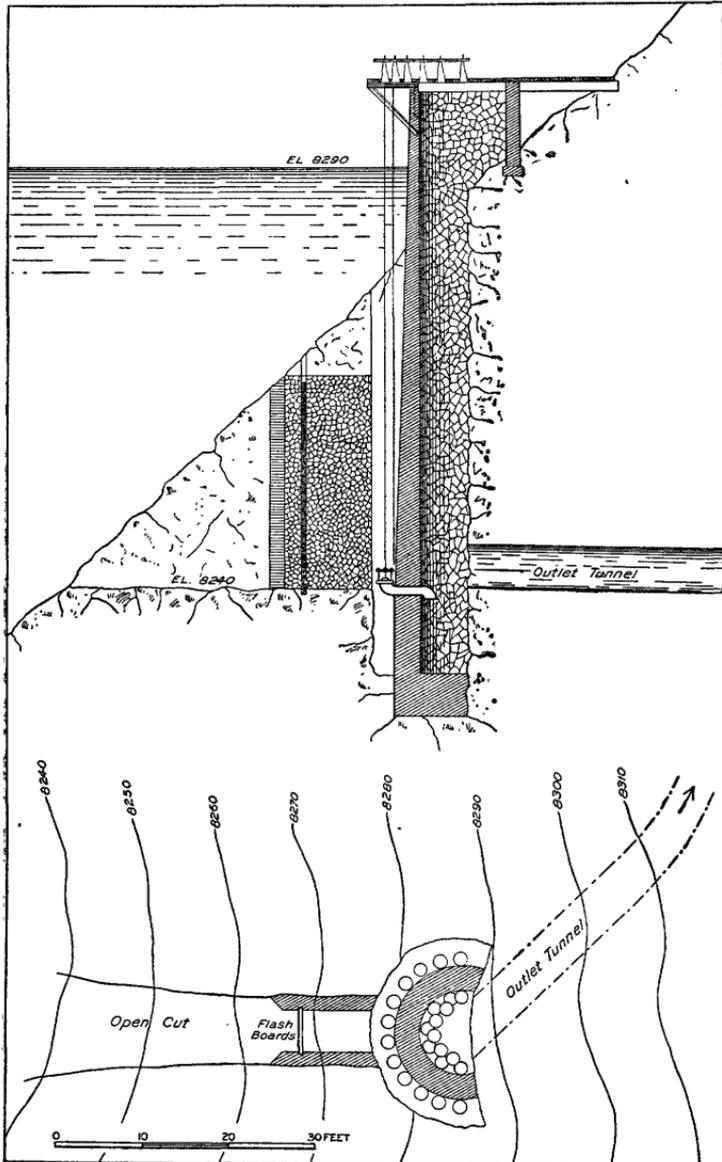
Sectional elevation and plan of gate tower for dam proposed by Kern-Rand Electric Power Company.
